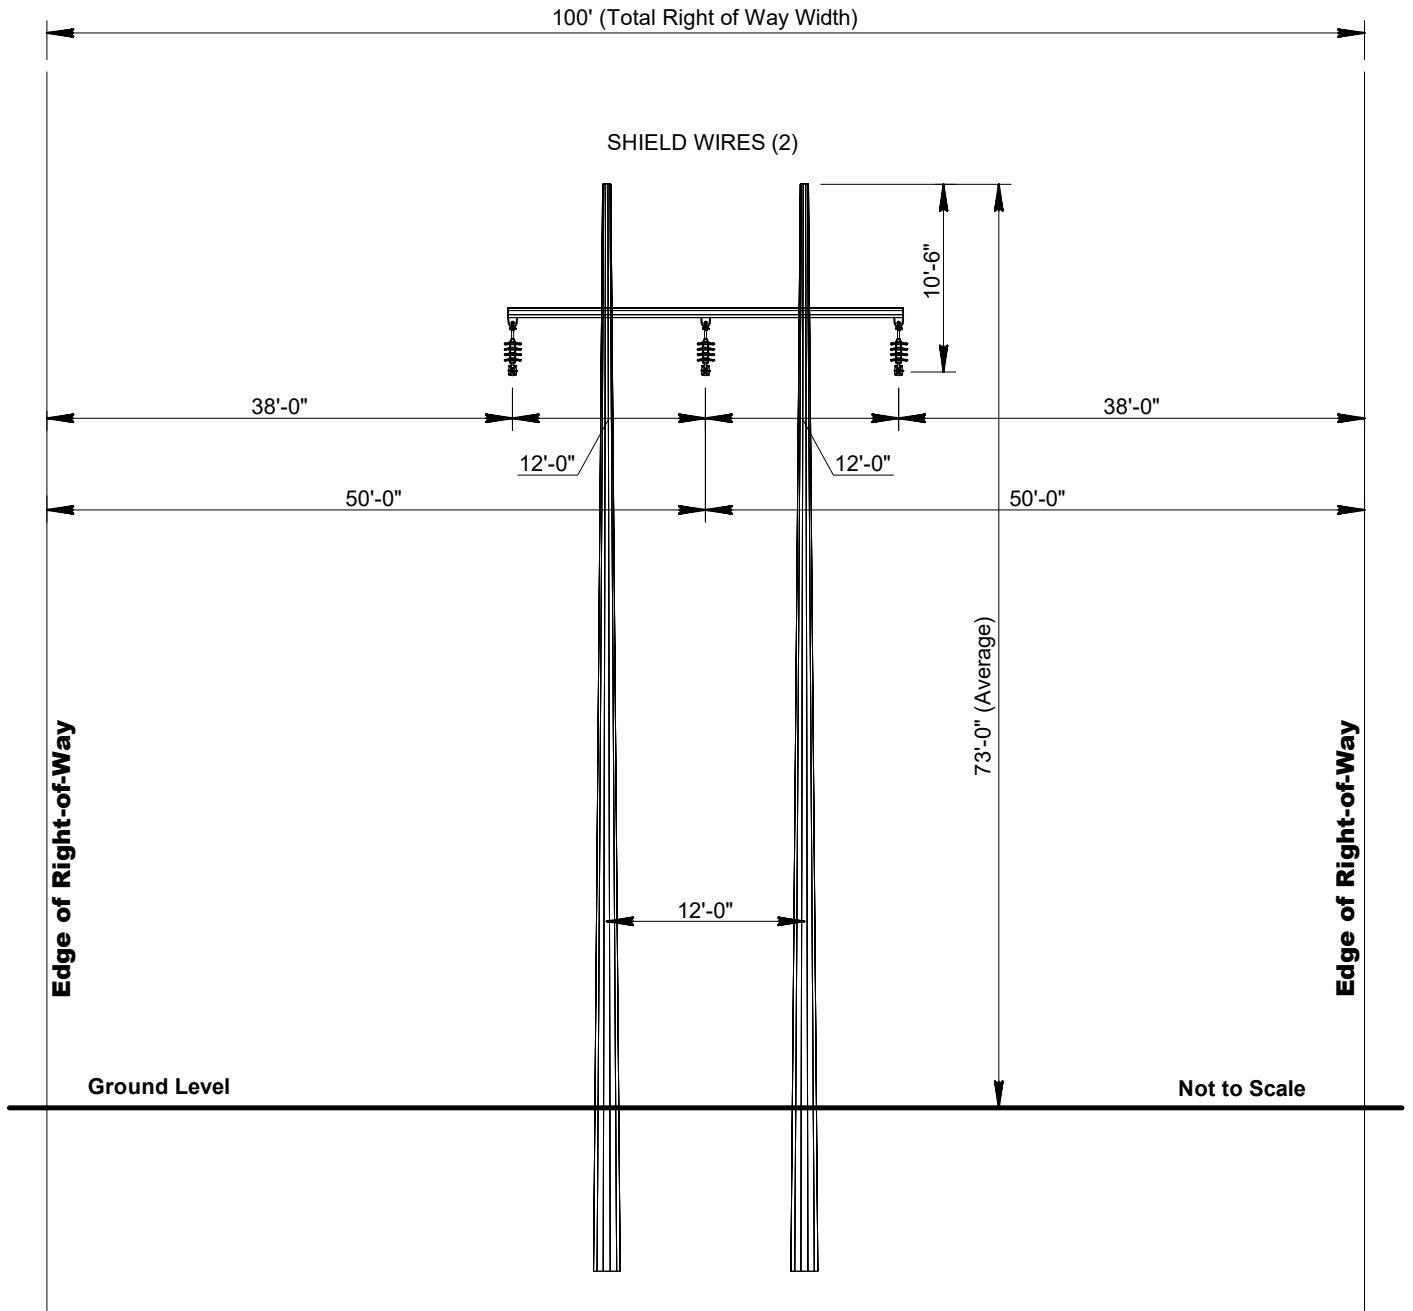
PROPOSED 69-kV H-FRAME
